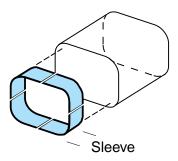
Cut Sleeve to Make L-Shaped Pieces
